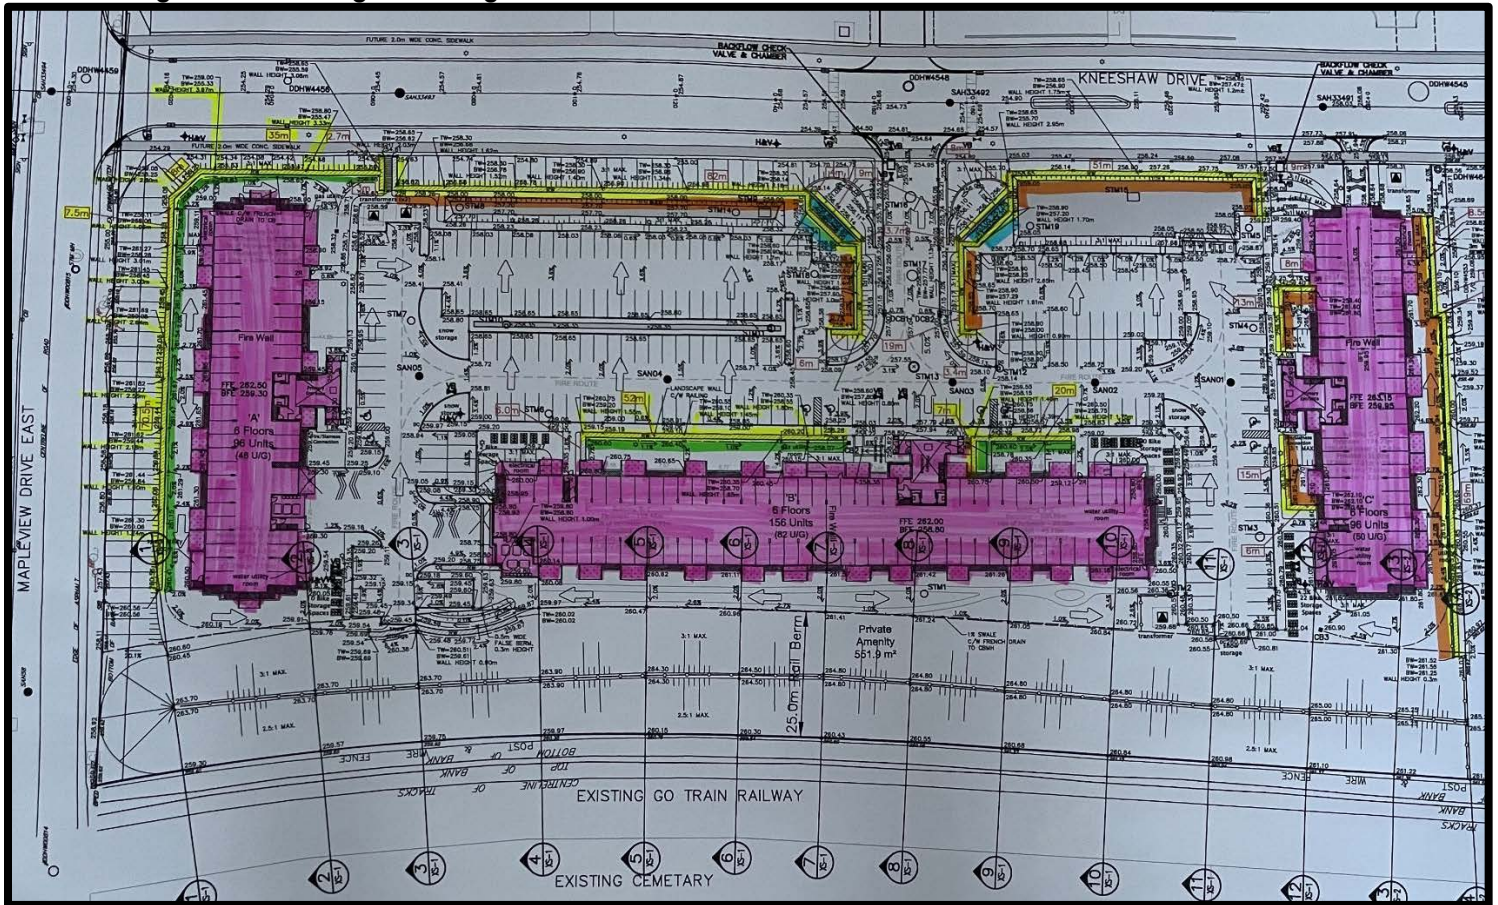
Ron Baird Art for Retaining Walls (southwest corner of Kneeshaw Drive and MVDE)
